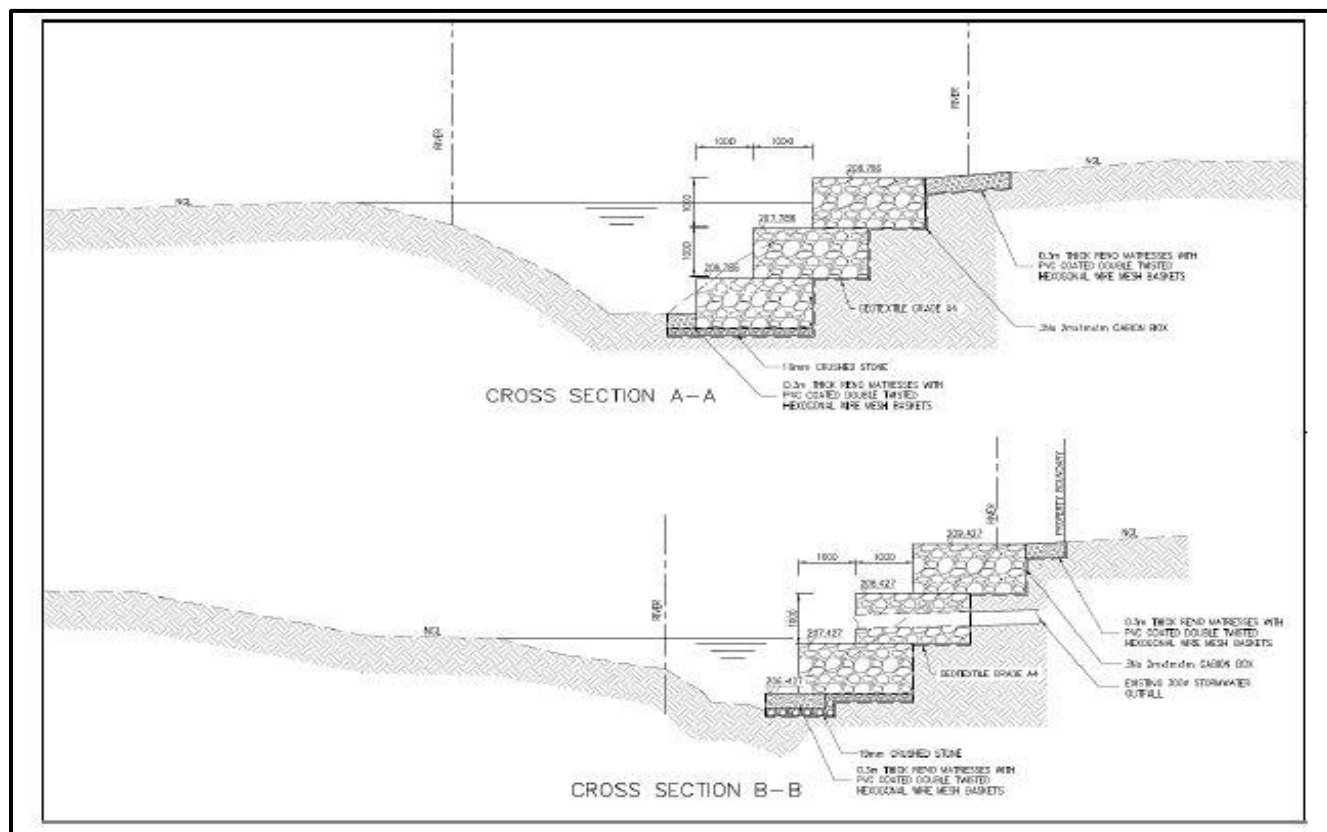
Generic cross-section for how gabions/reno mattresses will be installed along the riverbank.
